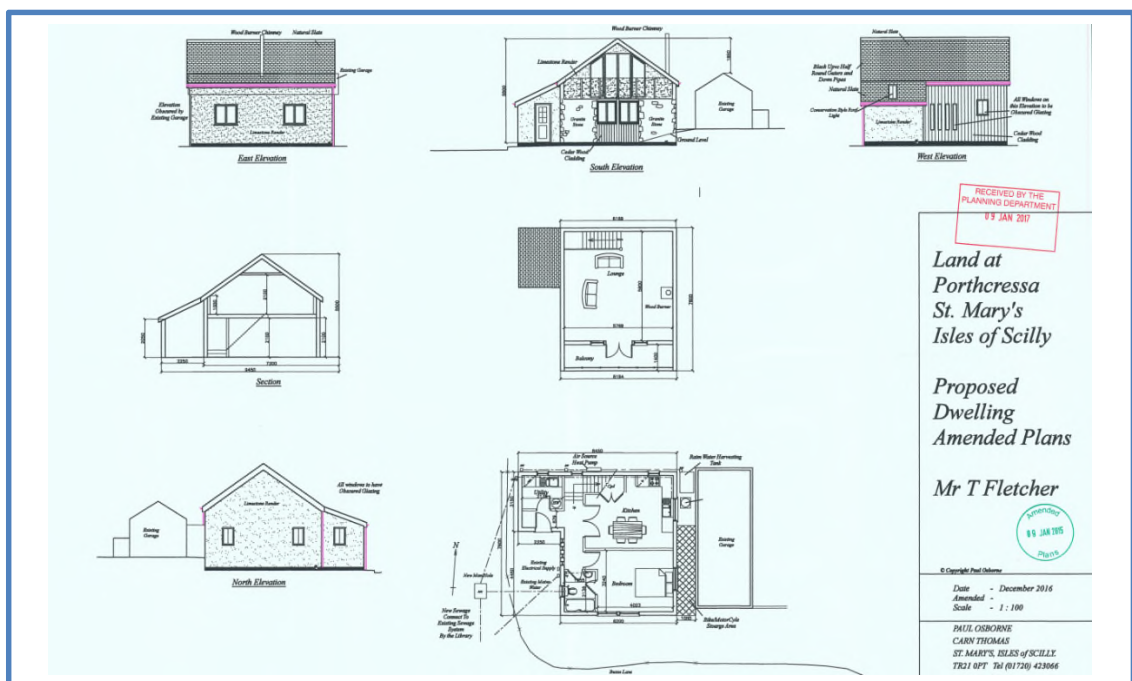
Previous Application Plans Excerpt (extracted from submitted plans)
